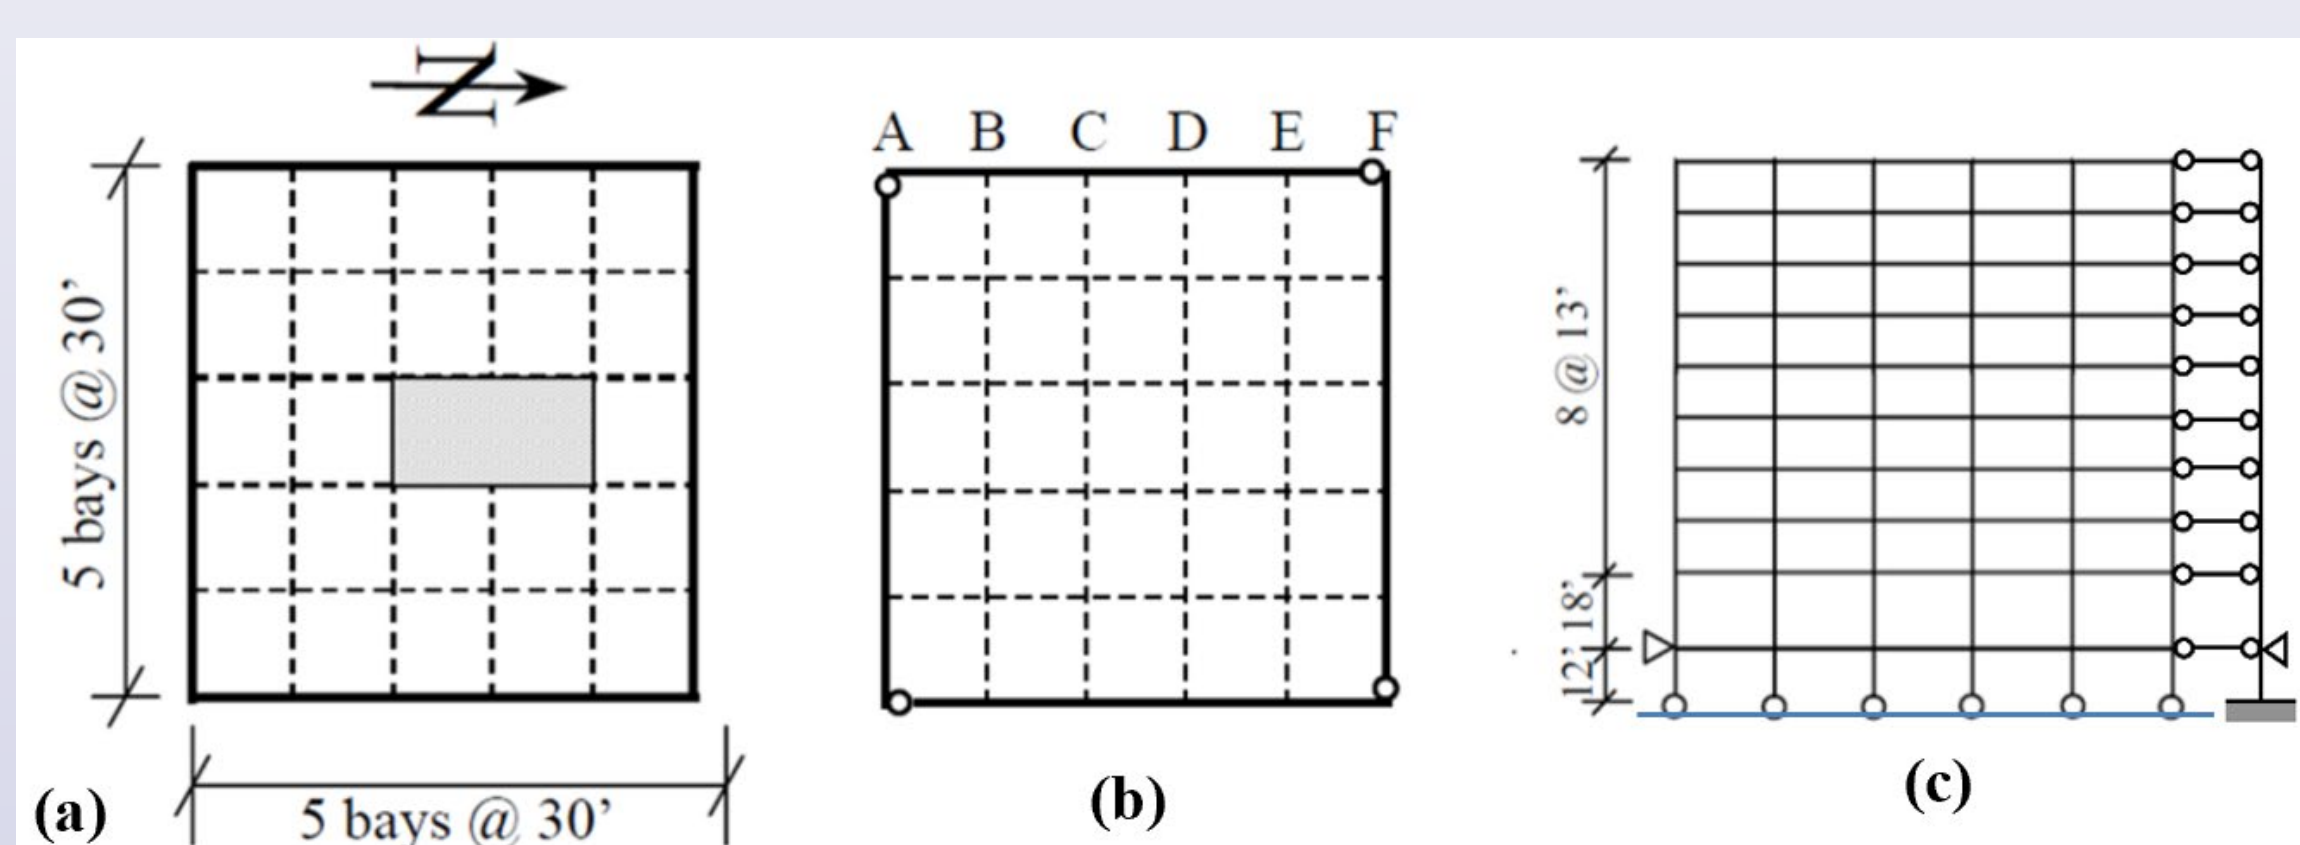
Layout of model building; a) plan view and dimensions, b) beam-column connections in plan, and c) elevation view of a perimeter frame
